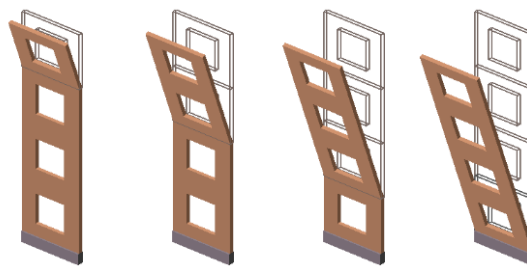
Overturning (out-of-plane) failure mechanism of masonry walls
